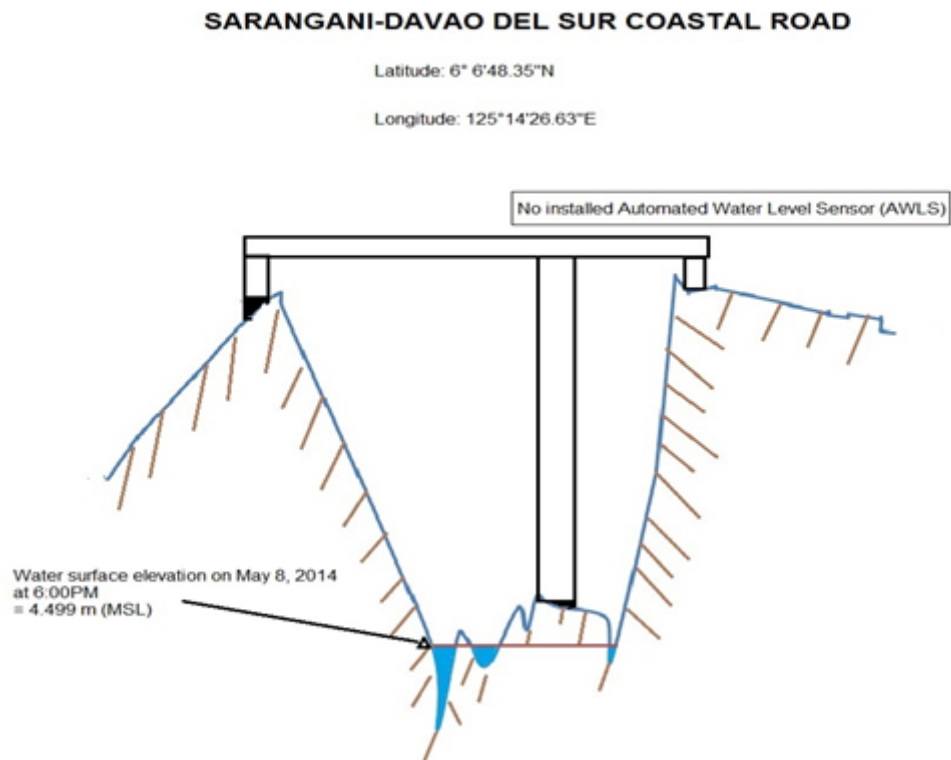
Cross-section diagram of Sarangani-Davao del Sur Bridge
